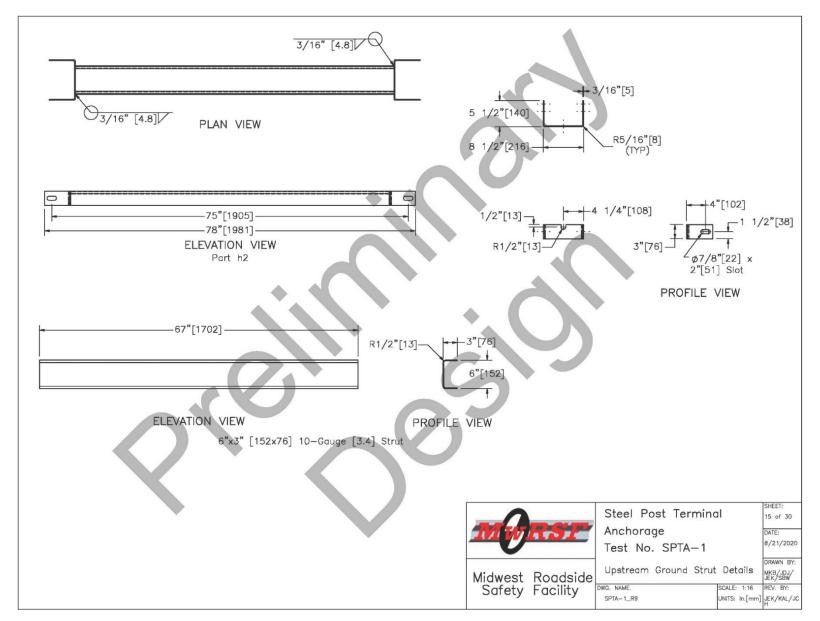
Upstream Ground Strut Details, Test No. SPTA-1
